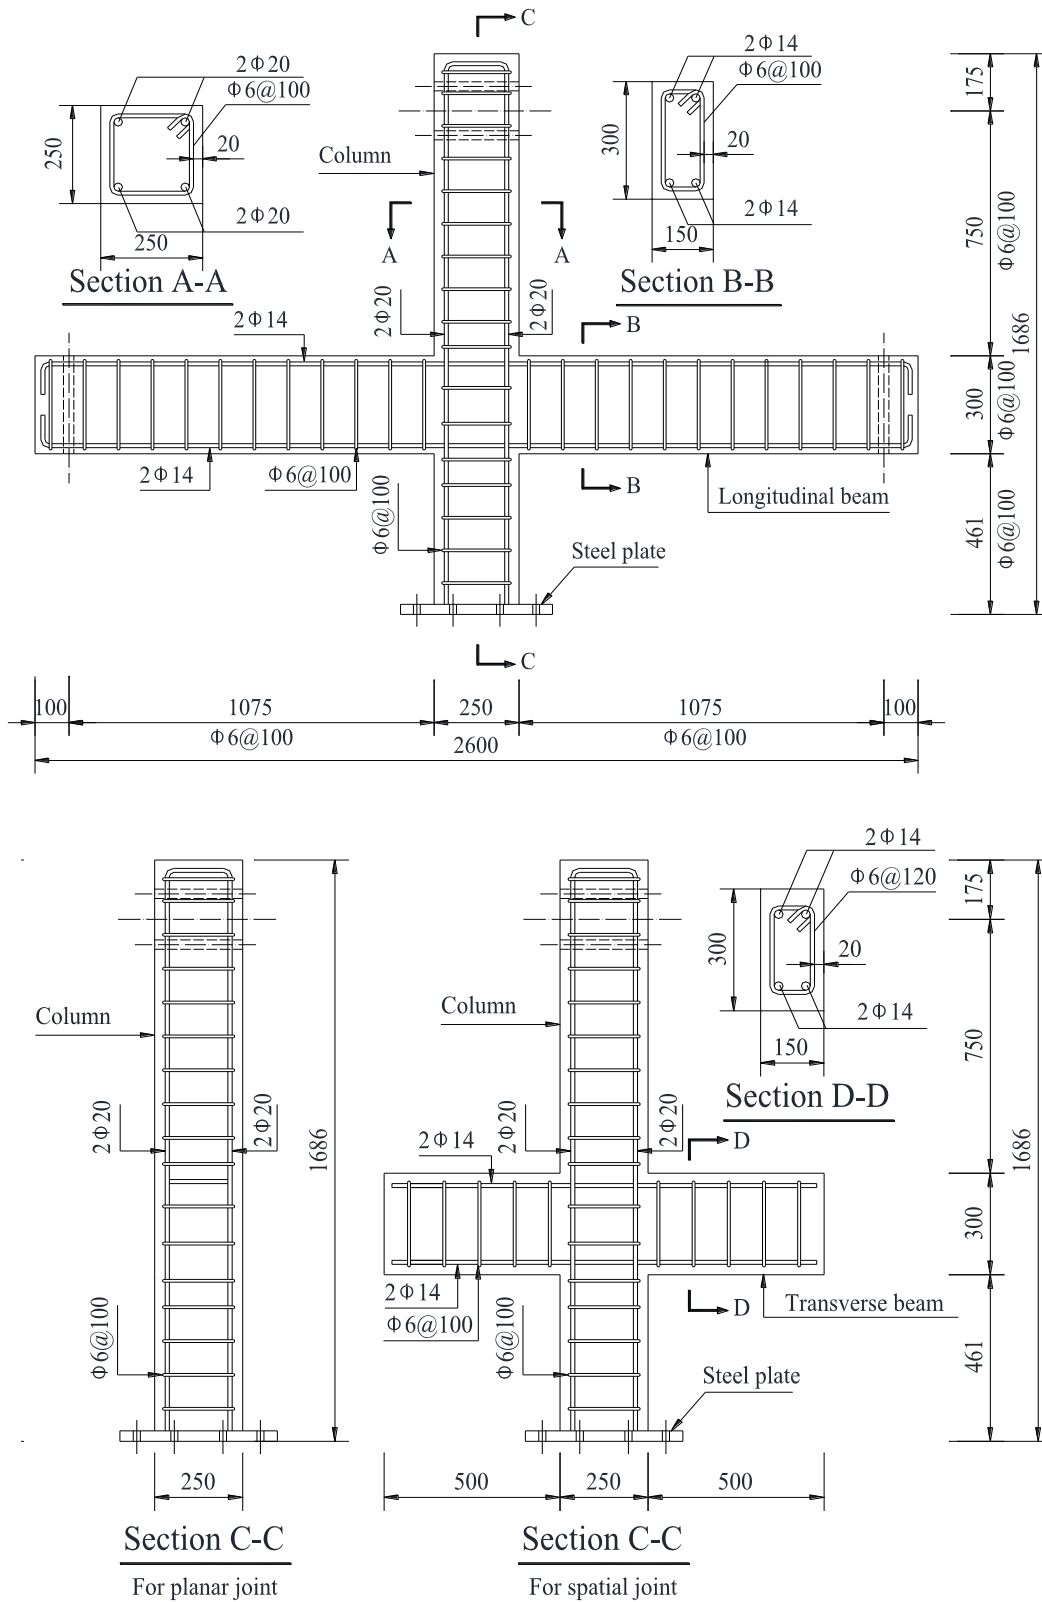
Dimensions and reinforcement details of original specimens (dimensions in mm)
